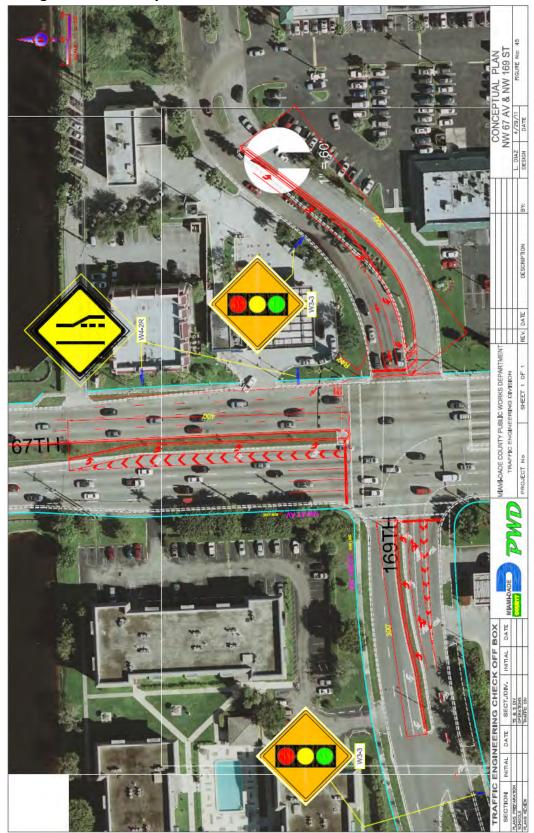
Conceptual Plan – NW 67 Avenue and NW 169 Street
